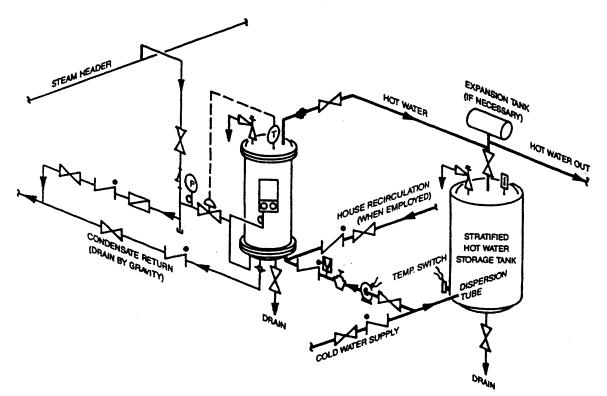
Piping Connections for a Single Heater used with a Stratified Storage Tank
